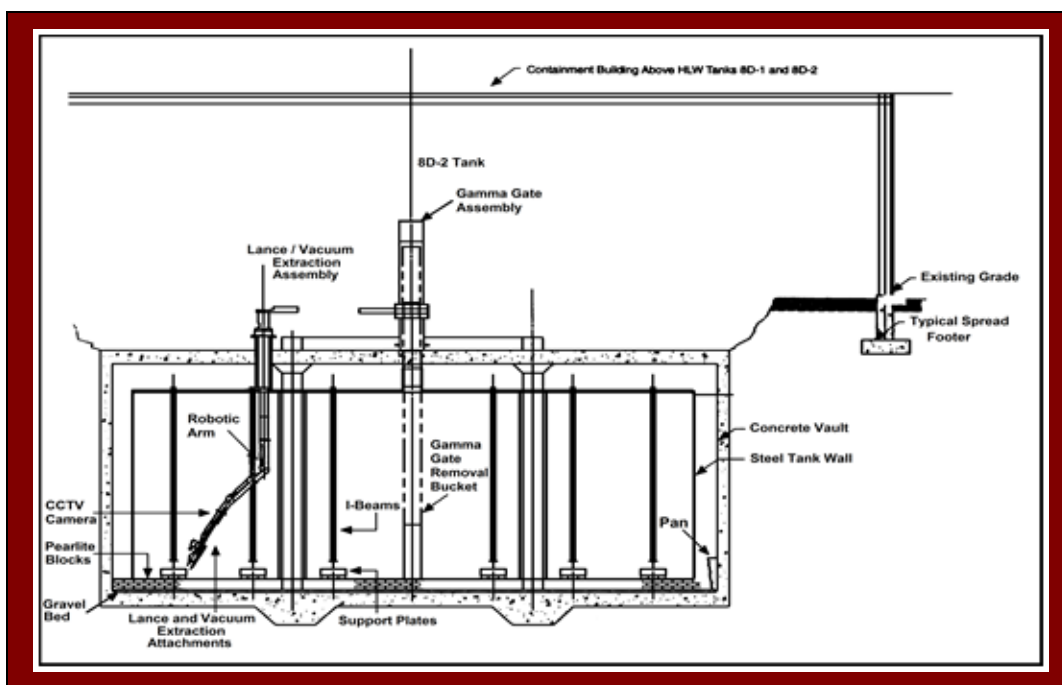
In-Tank “Through the Risers” Removal System
